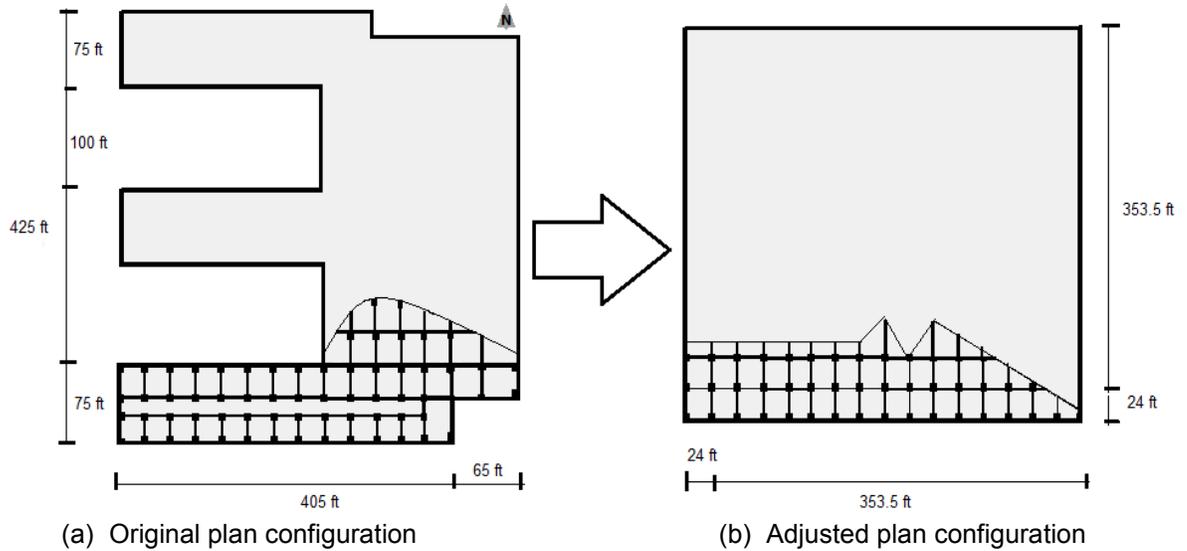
Structural framing plan configurations used in life cycle assessment
